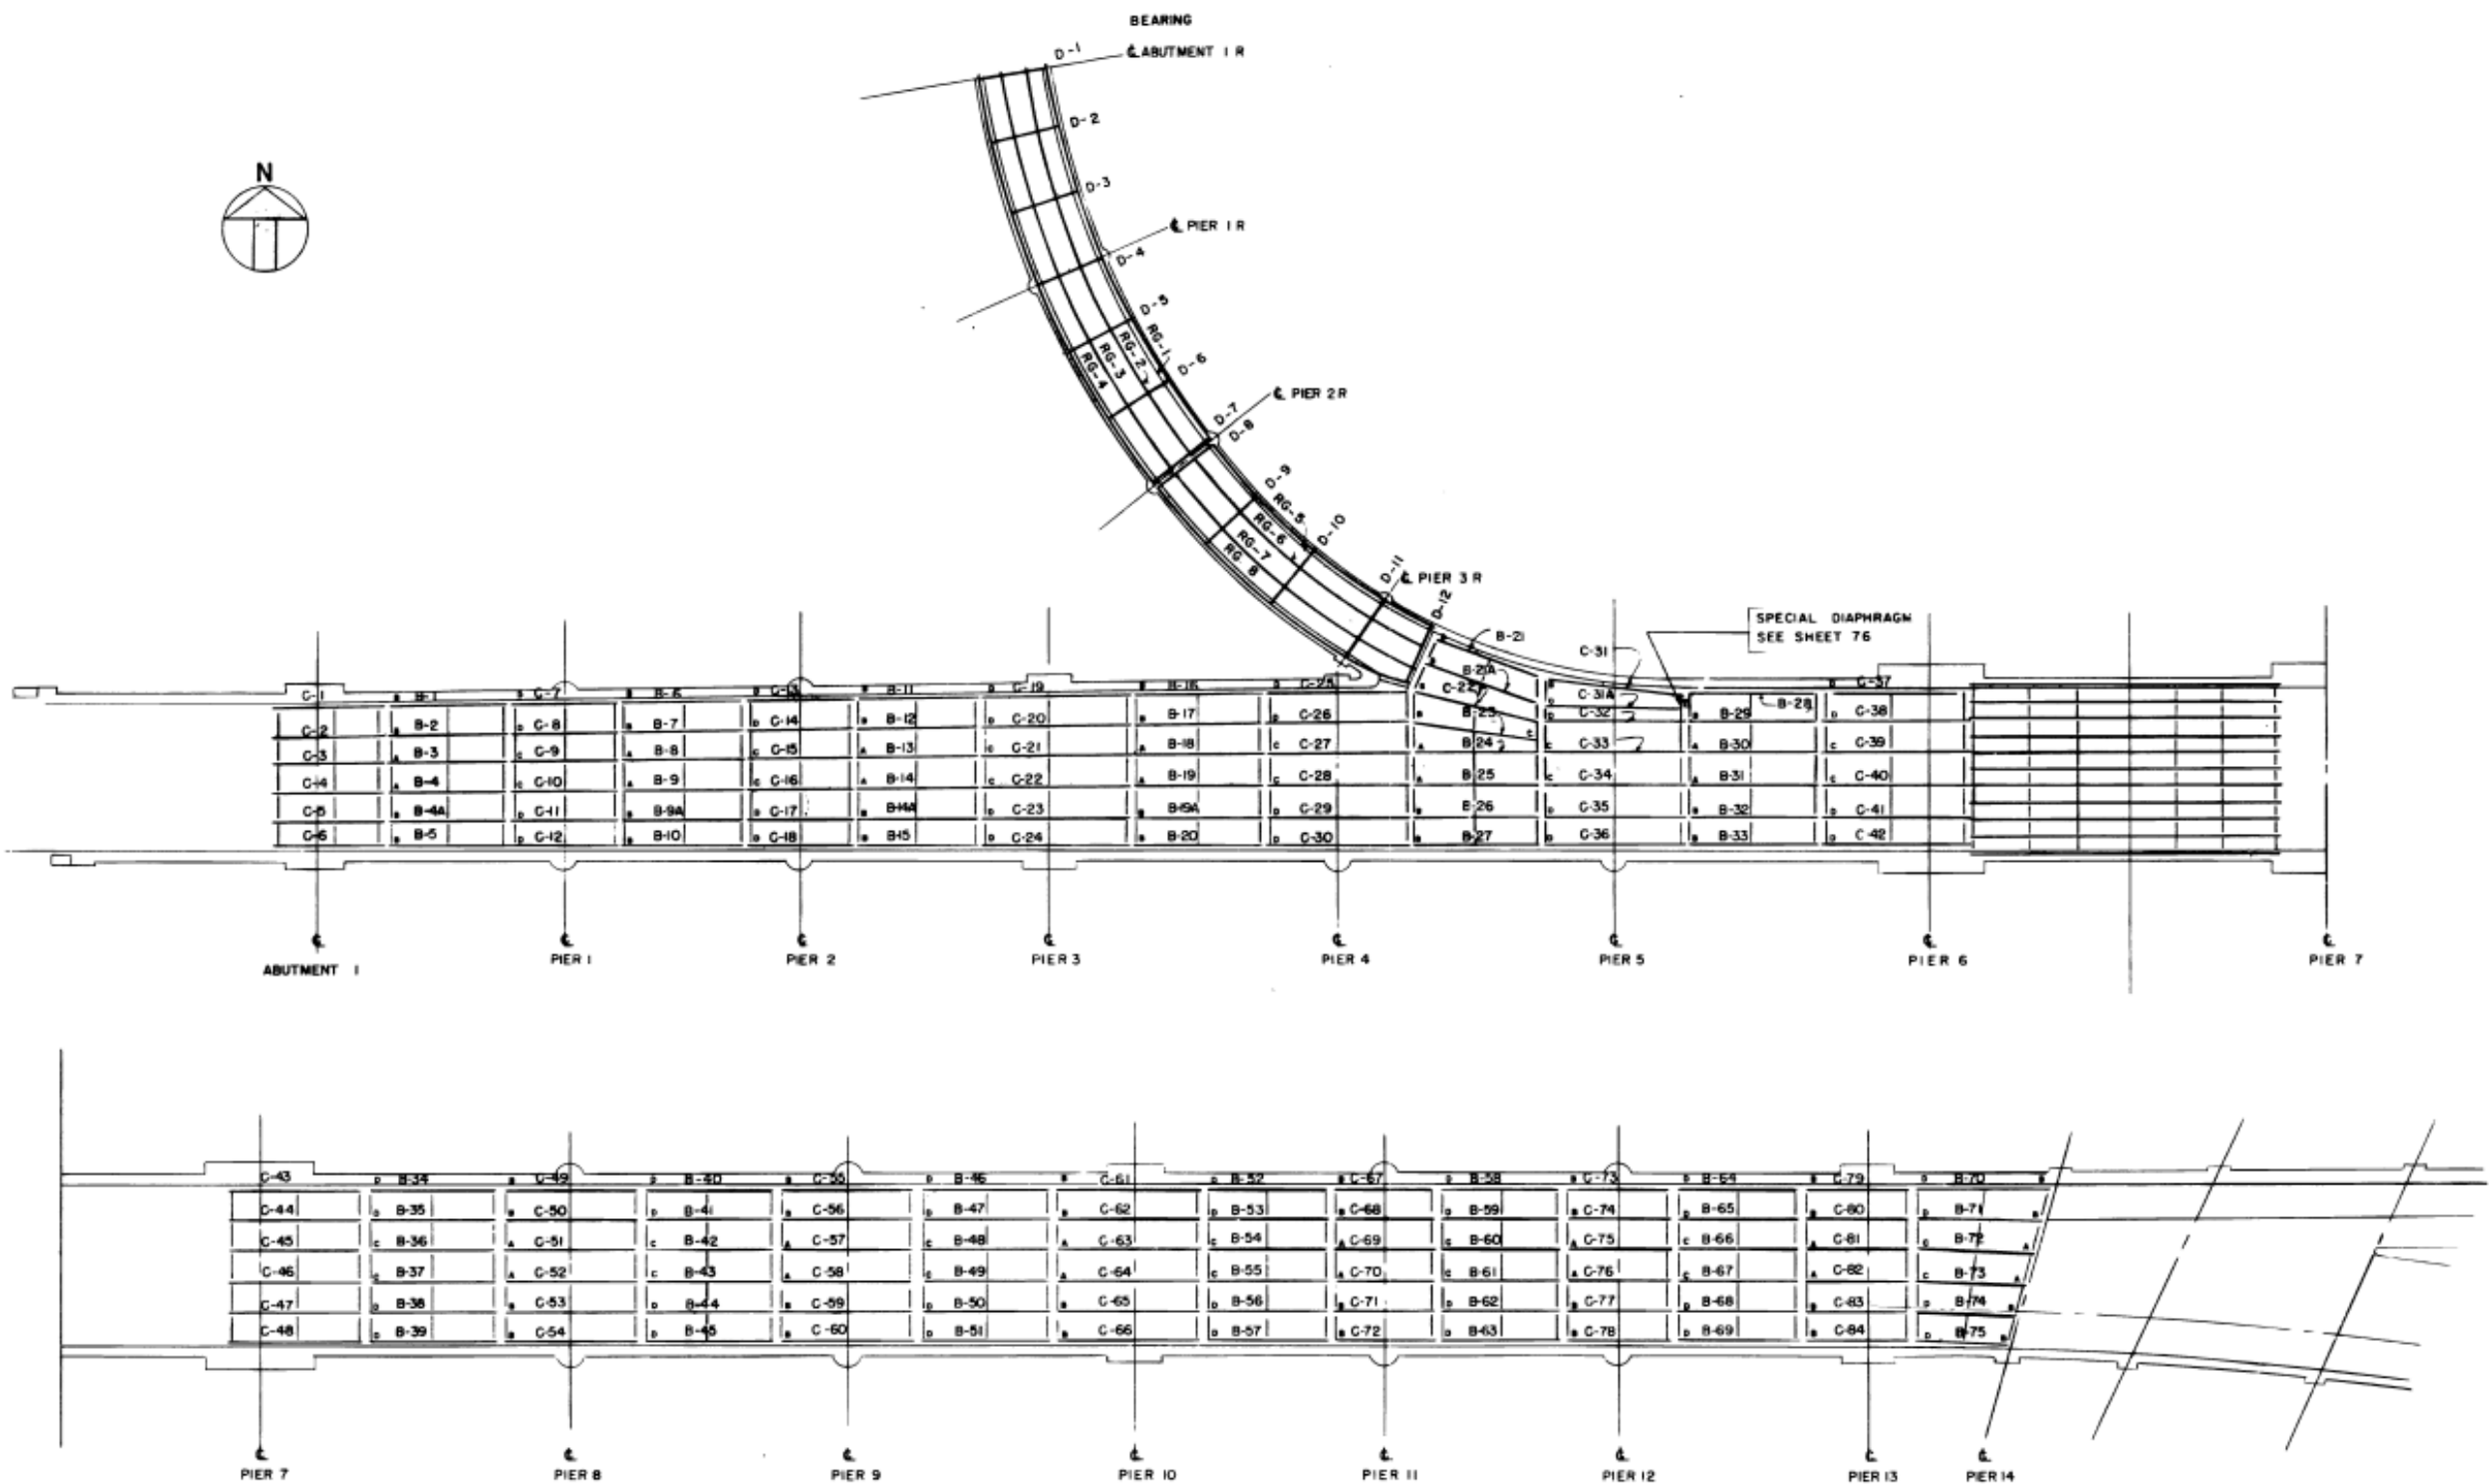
Full Framing Plan with concrete beam designations (Sheet 70, Framing Plan) of original plans (1967).
